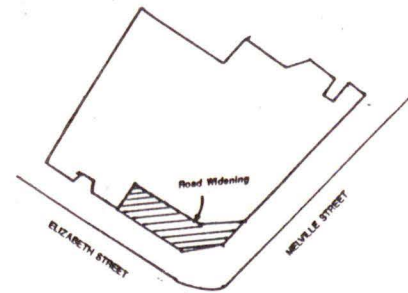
Possible reinstatement of corner previously taken for road widening
